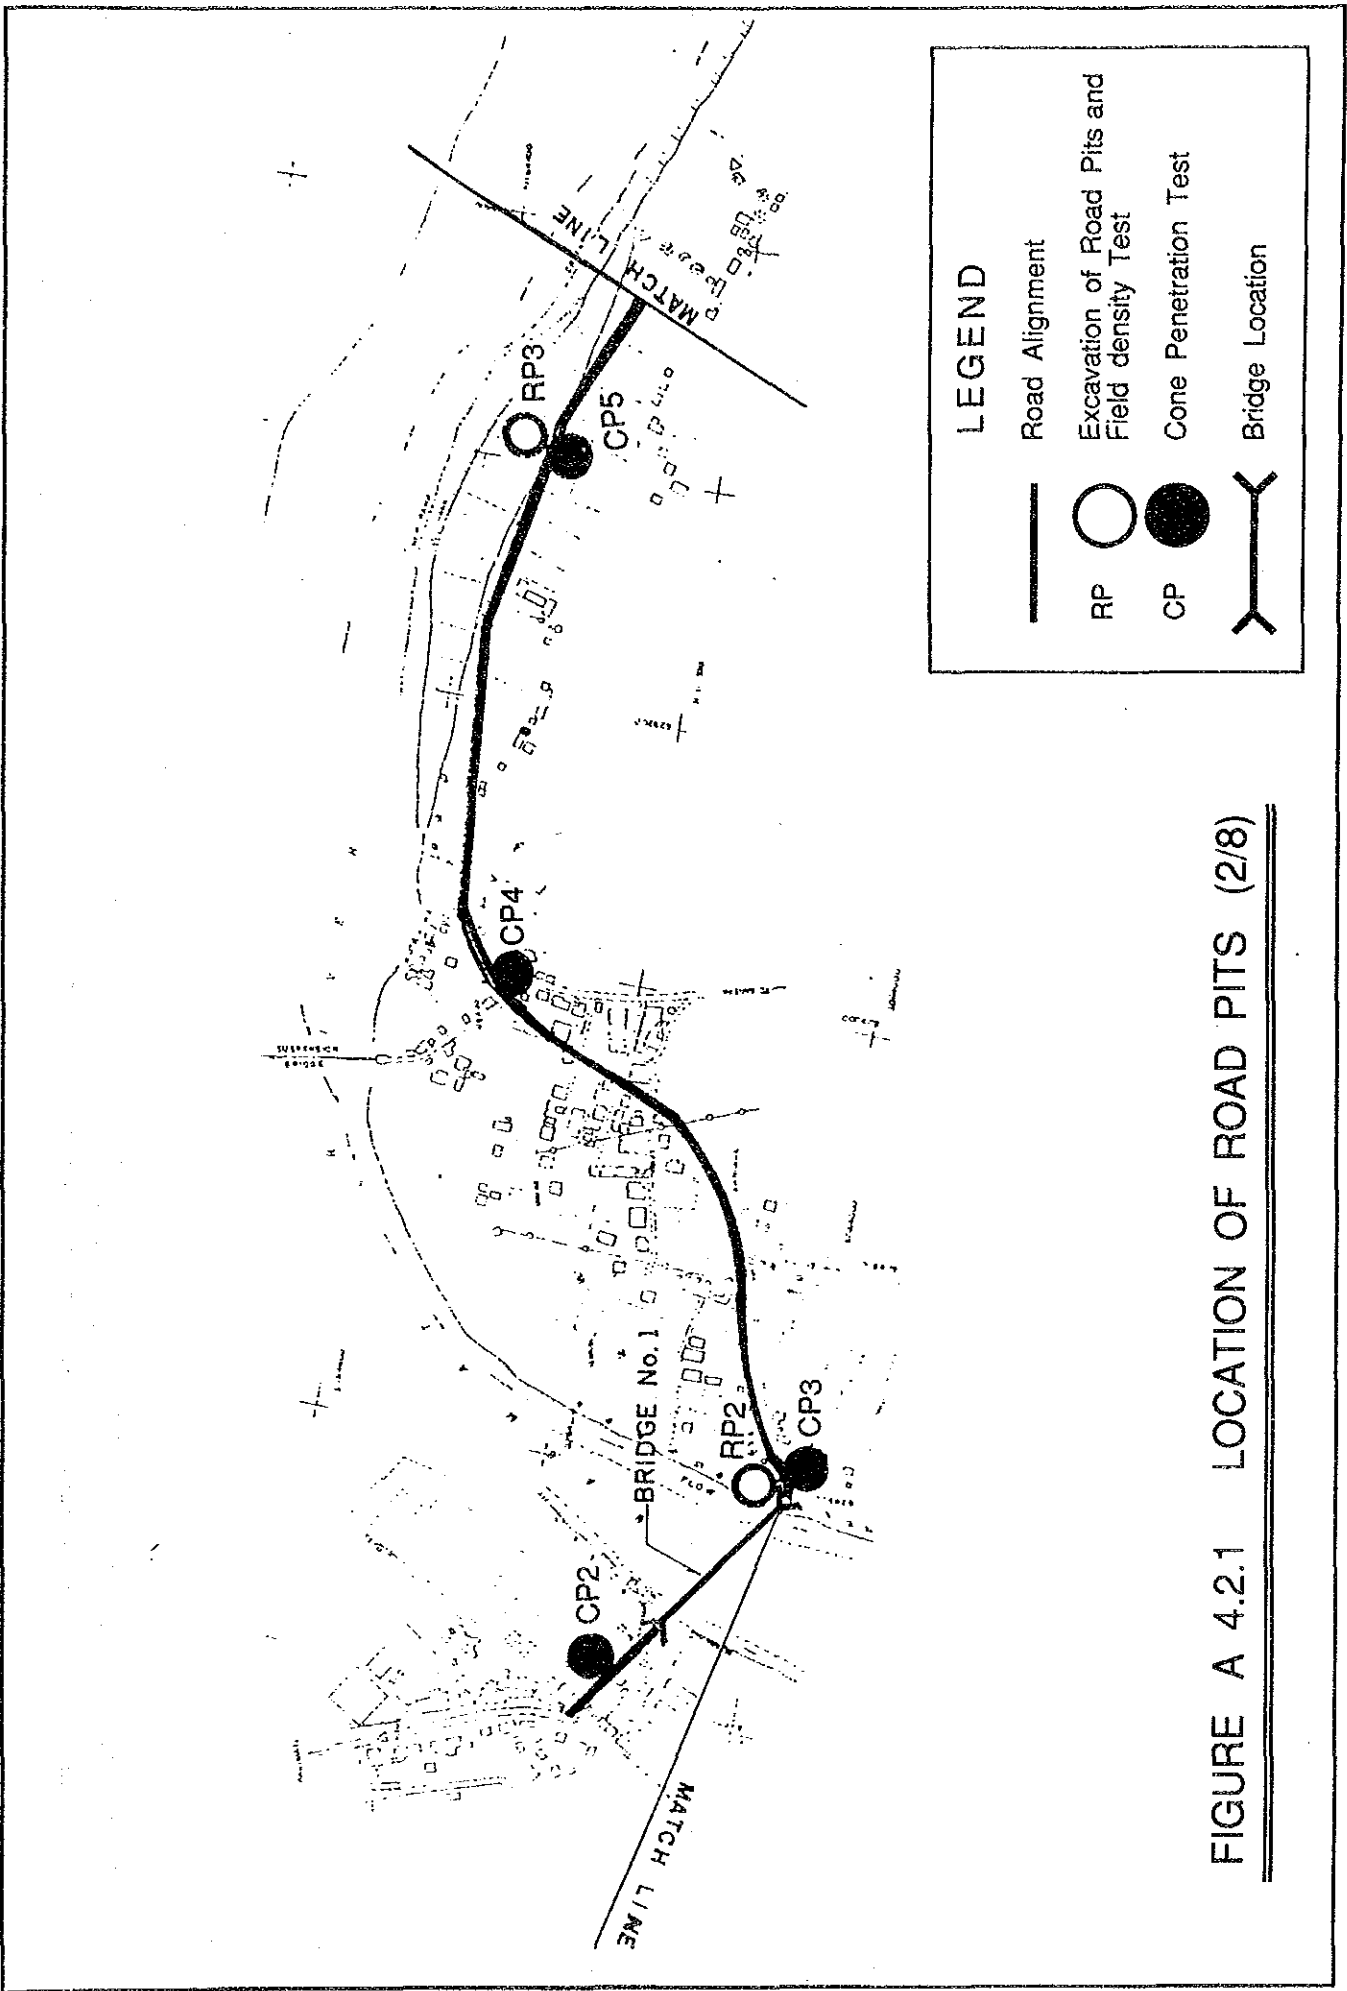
LOCATION OF ROAD PITS (2/8)
